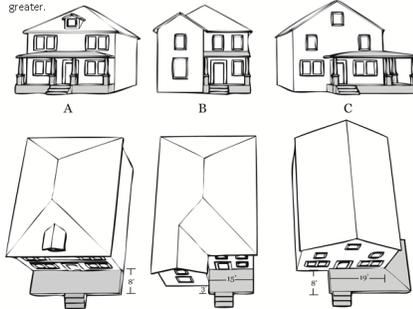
FIGURE G: Porches: The front porch element provides an additional "outdoor living room" which promotes neighborhood interaction. A variety of front porch arrangements can be utilized on front building facades subject to minimum dimensional requirements.
